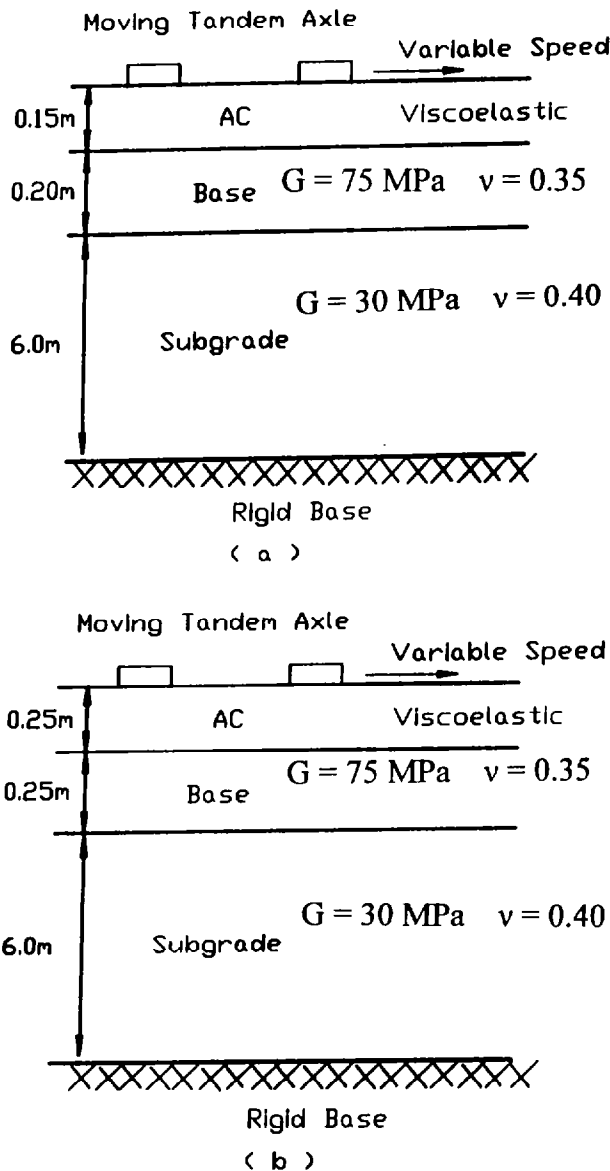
Pavement structure properties: (a) thin pavement (b) thick pavement.
